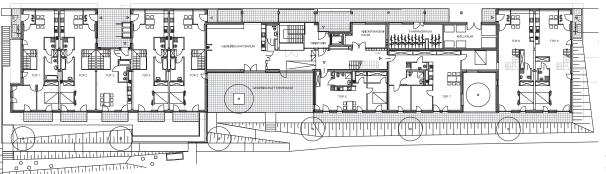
[ro\*sa]<sup>22</sup> building floor plan example (Cohousing Cultures, 2018)
